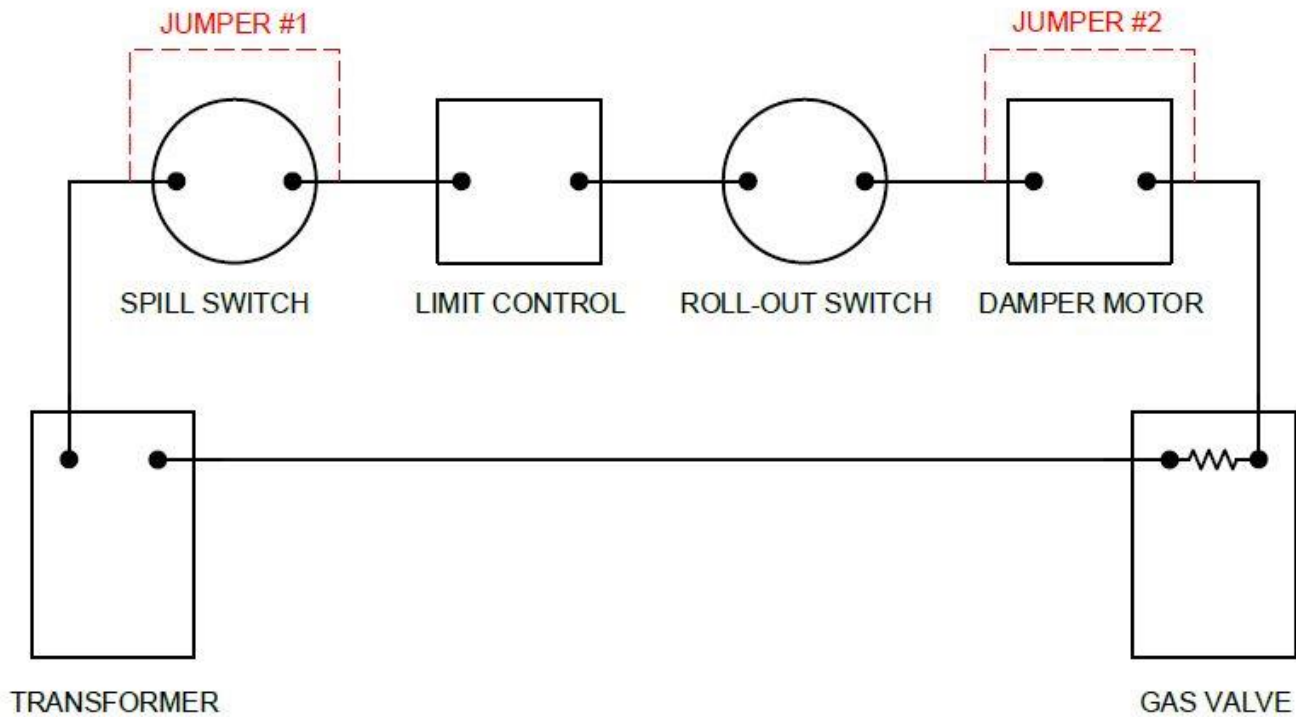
Wiring diagram identifying how the vent spill switch and damper motor position end switch were bypassed with “jumpers” allowing the gas valve to operate
